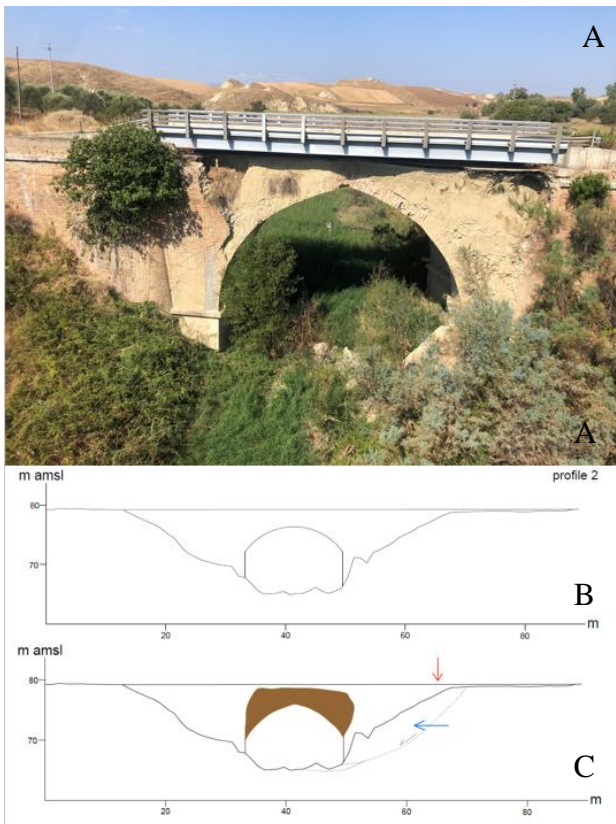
Bridge on SP 103: (A) Deformed arch. (B) Reconstruction of the bridge on the terrain profile. (C) Ogival deformation of the arch and main deformation direction.
